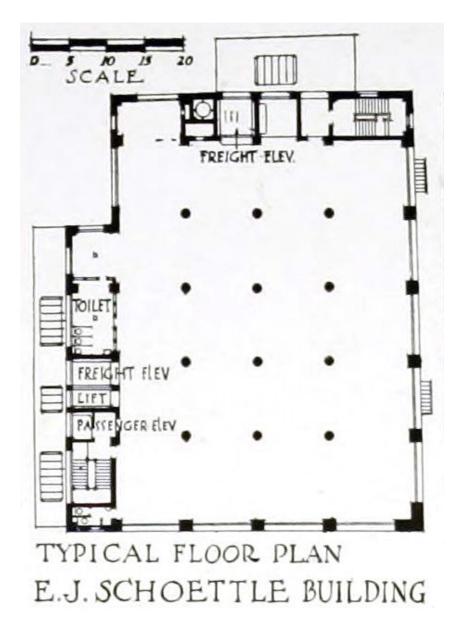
Typical Floor Plan, 1916. (from *The Brickbuilder* 25.9, September 1916)
